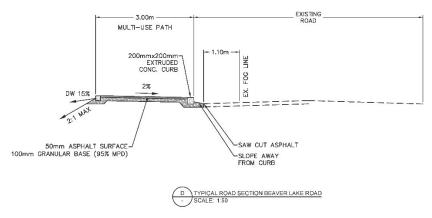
Typical Road Section showing proposed Beaver Lake Road improvements
